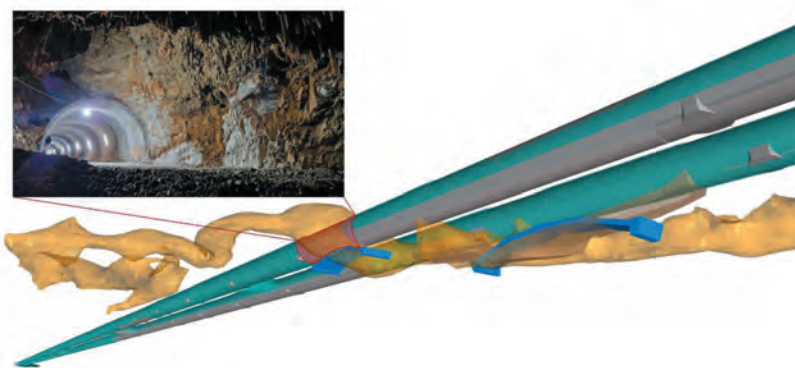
BIM model of a karst cave and underground arch bridges spanning over it.
